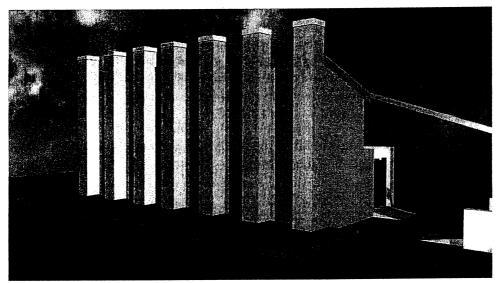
Back elevation of the VIP latrine superstructure showing the block work vent pipe
